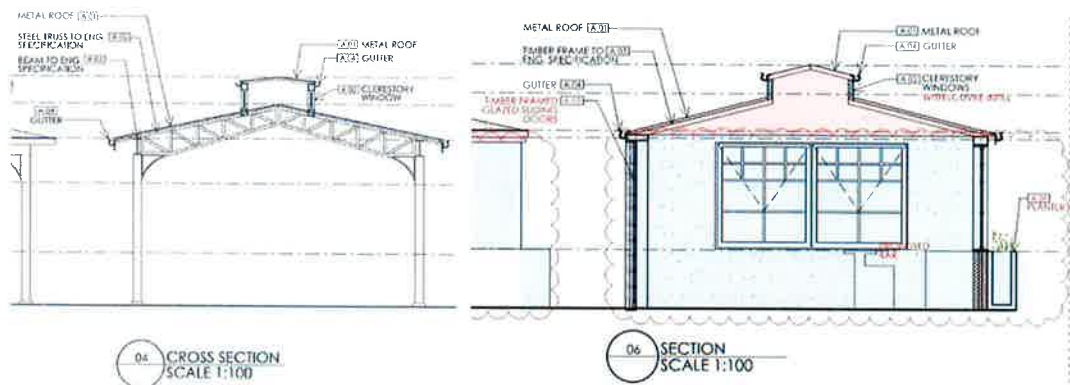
DA approved (left) and proposed (right) Section (Source: Akin Creative).
